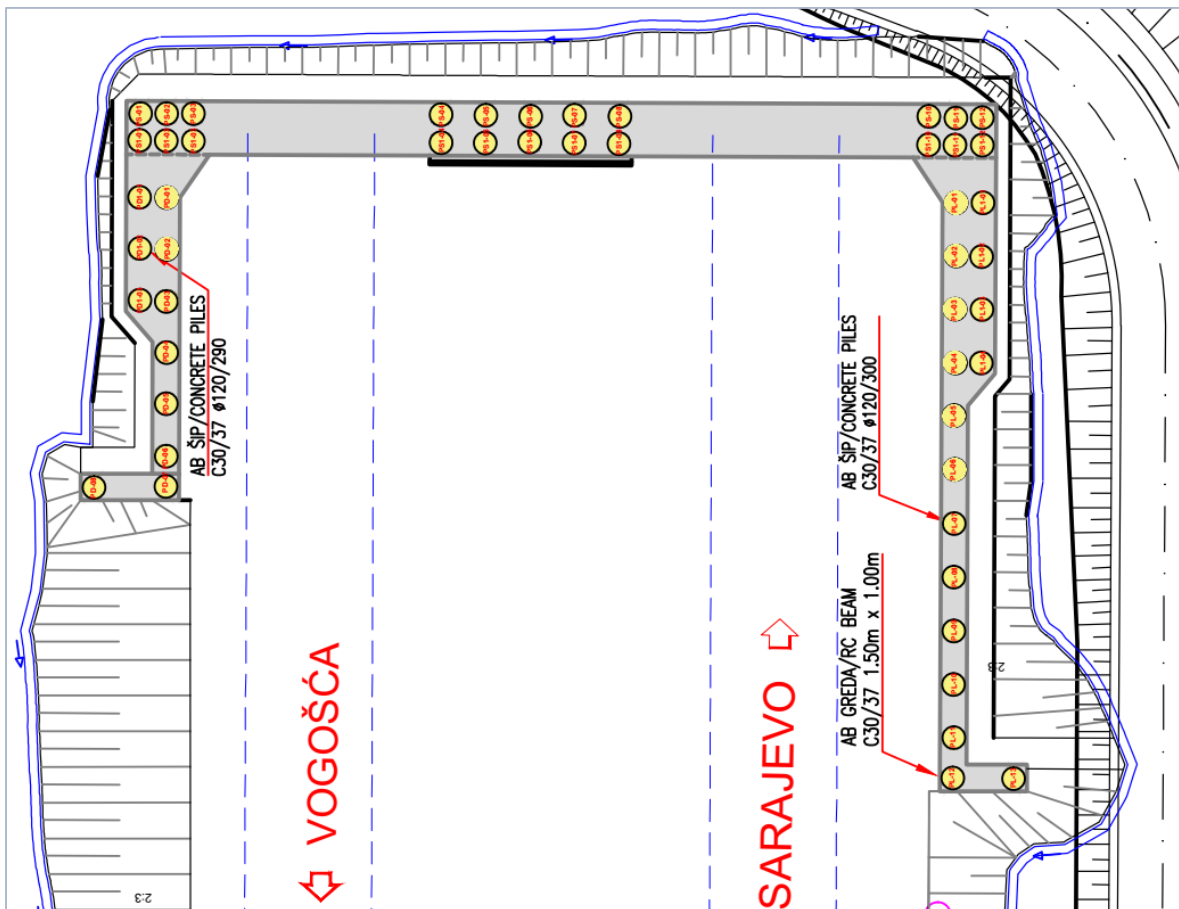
Layout plan of the exit portal approach cutting of the Kobilja Glava tunnel [7]
